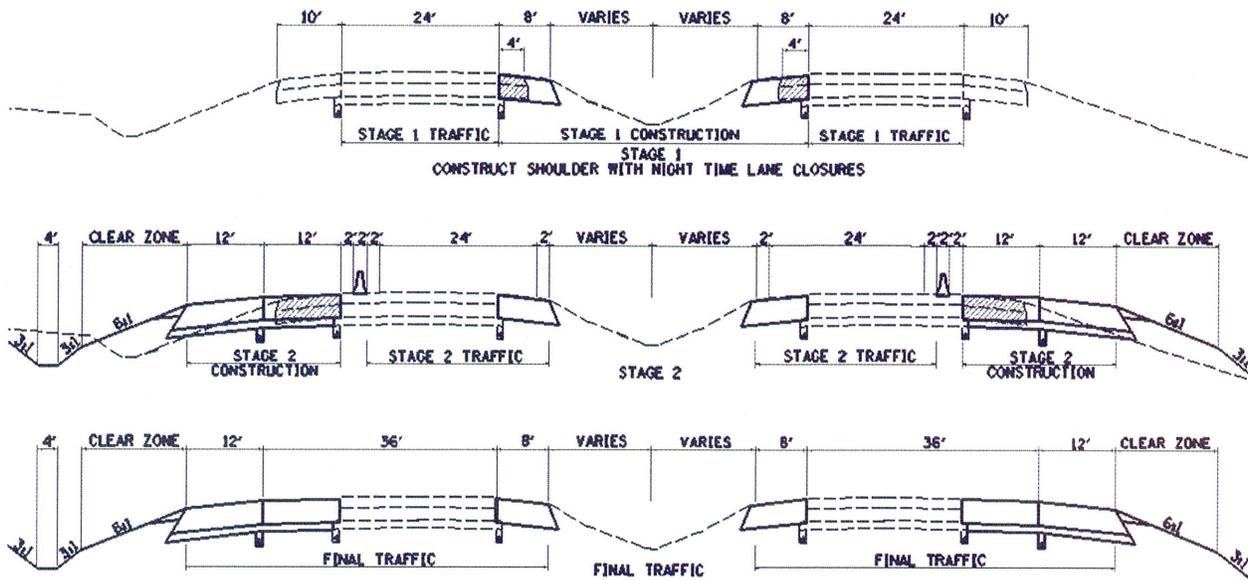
STAGE CONSTRUCTION LAYOUT – OUTSIDE WIDENING
